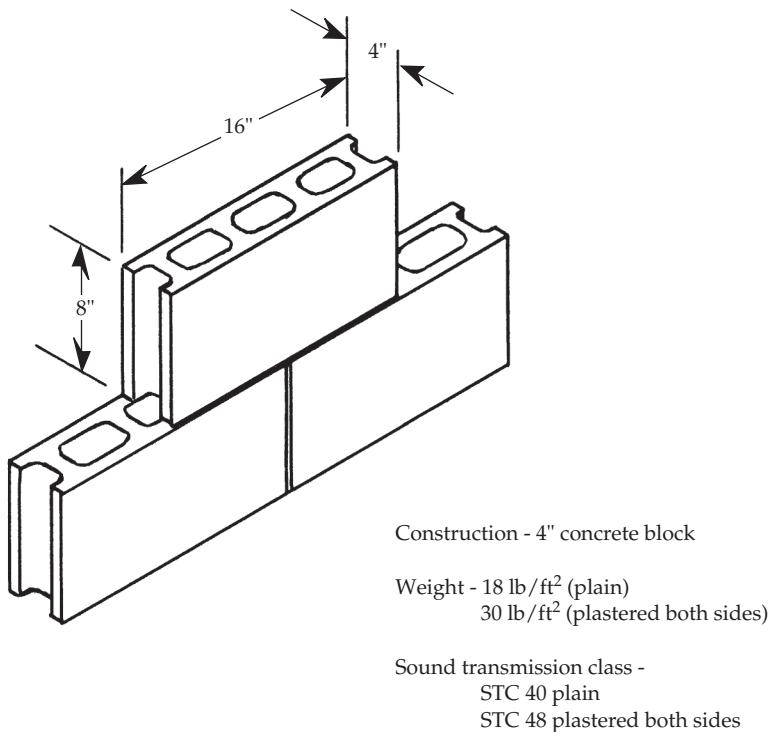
Concrete-block (4-in) wall construction. (Solite Corporation.)
